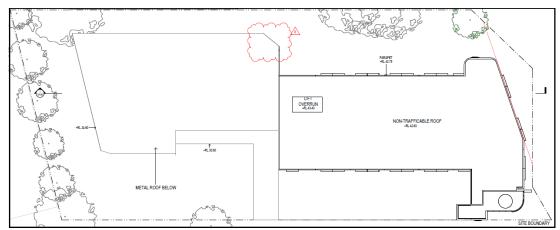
Proposed hotel roof plan (DA-102, Issue D)
